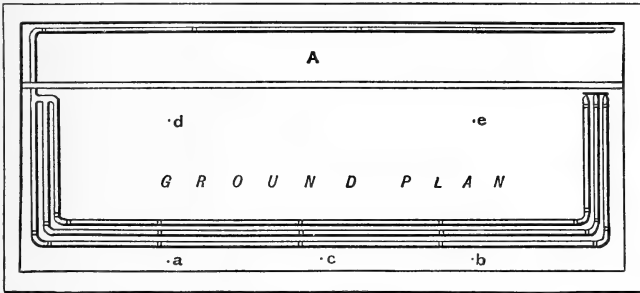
LEAN-TO HOUSE, WITH PARALLEL TRELLIS.
